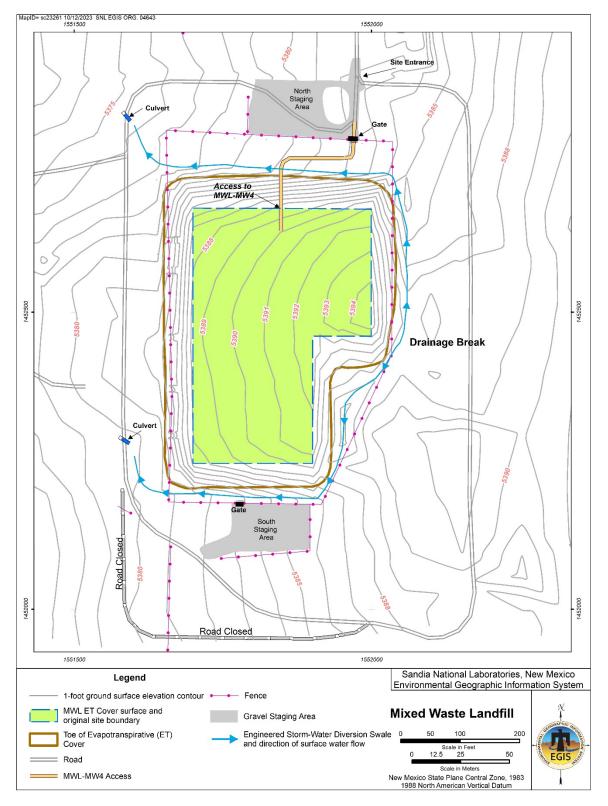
Mixed Waste Landfill Engineered Storm-Water Diversion Swale
